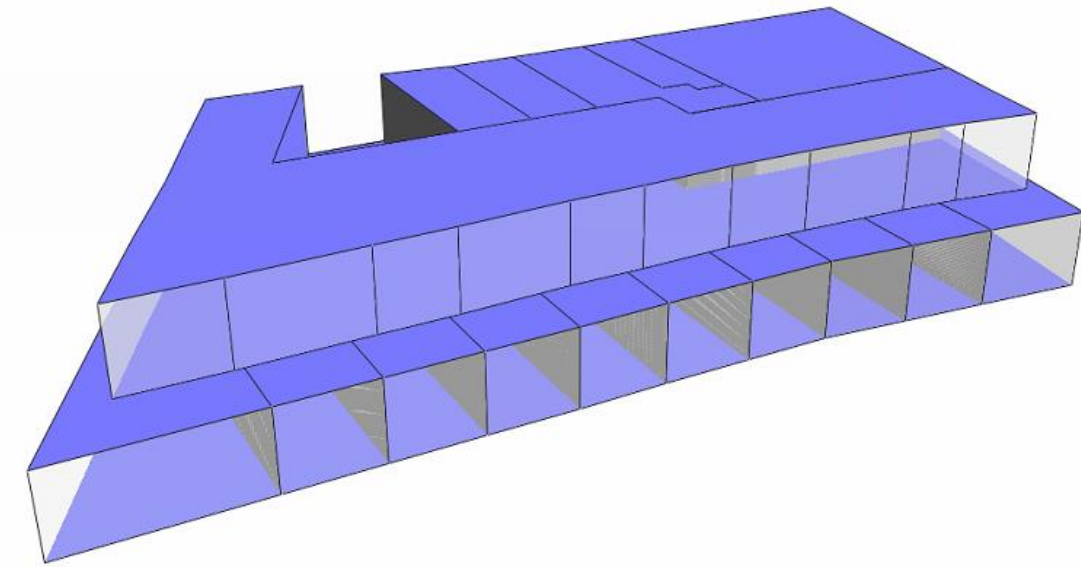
IES modelling image showing the rooftop bar and Level 6 hotel rooms modelled
